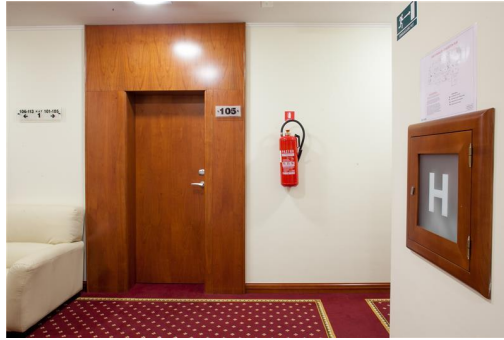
Fire extinguisher and hydrant in the hotel room (<http://www.travelino.hr>)
